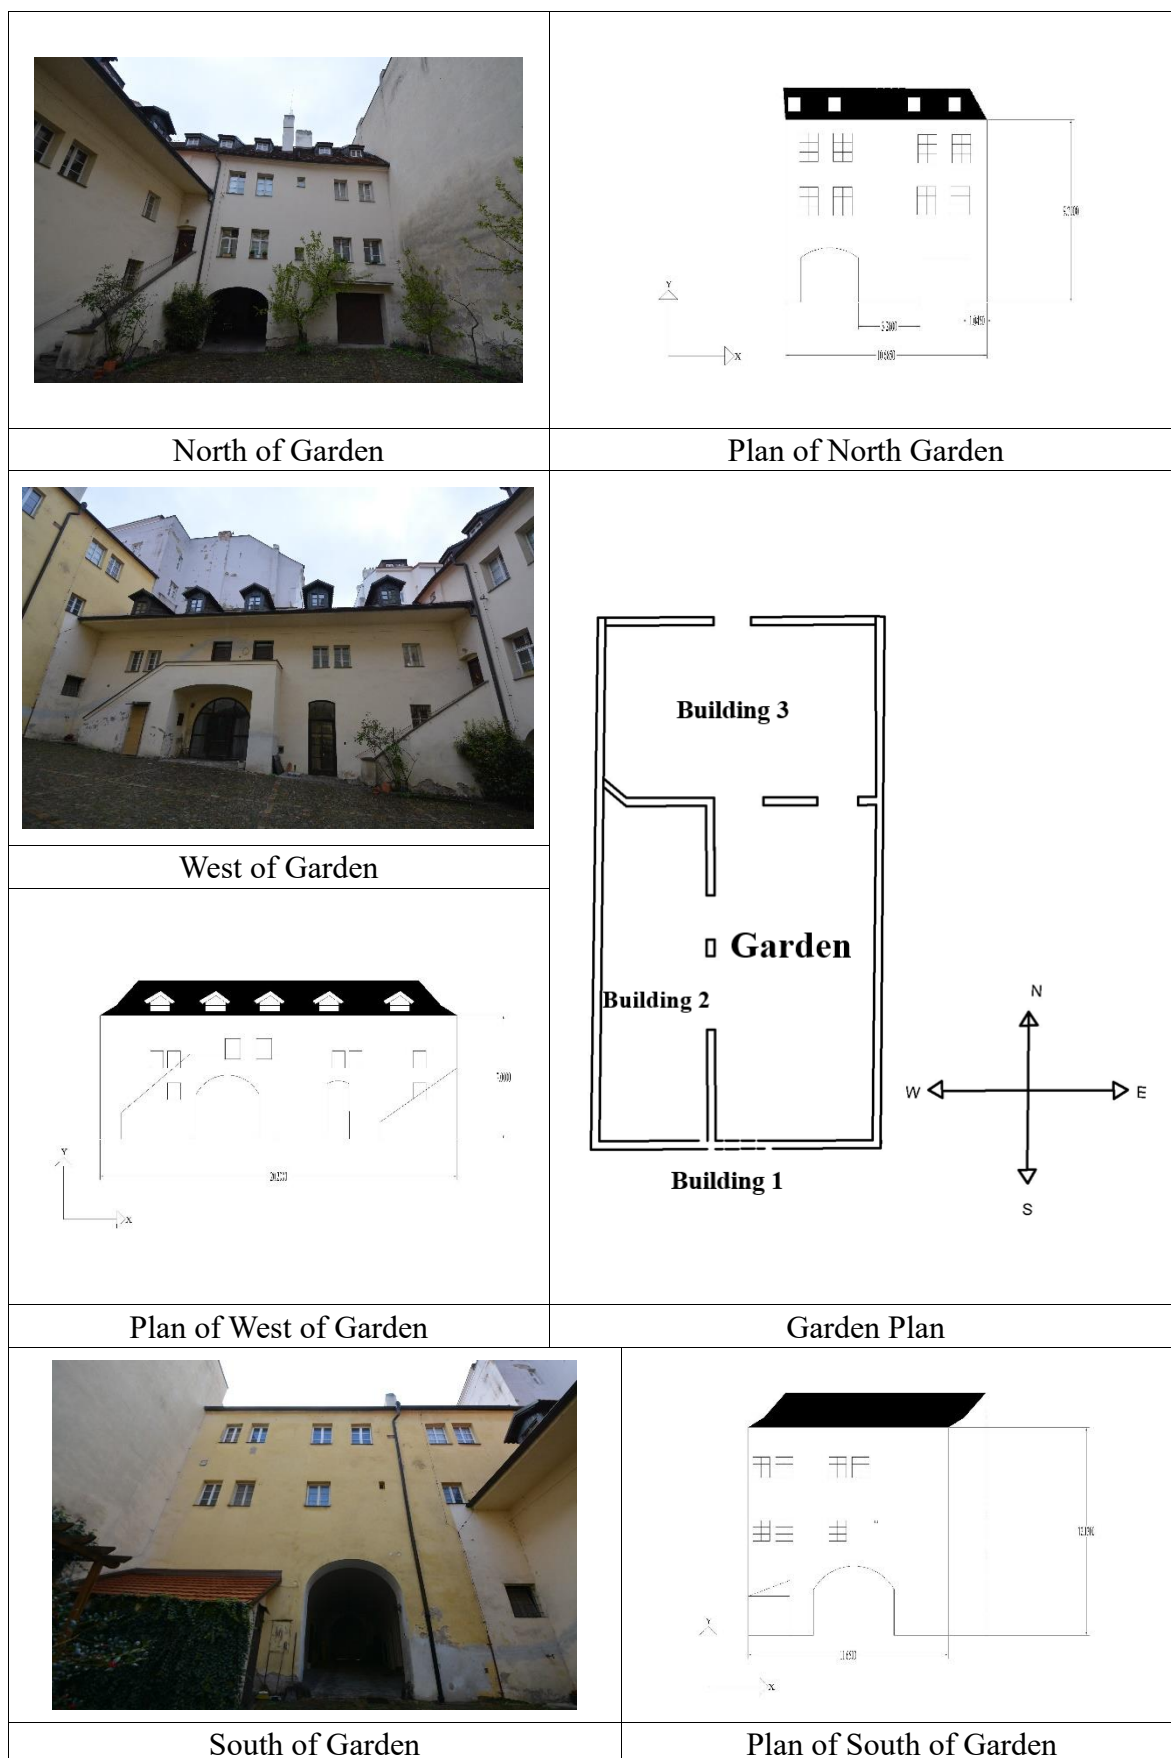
Interior Garden and Conjunction Buildings with Dimensions
